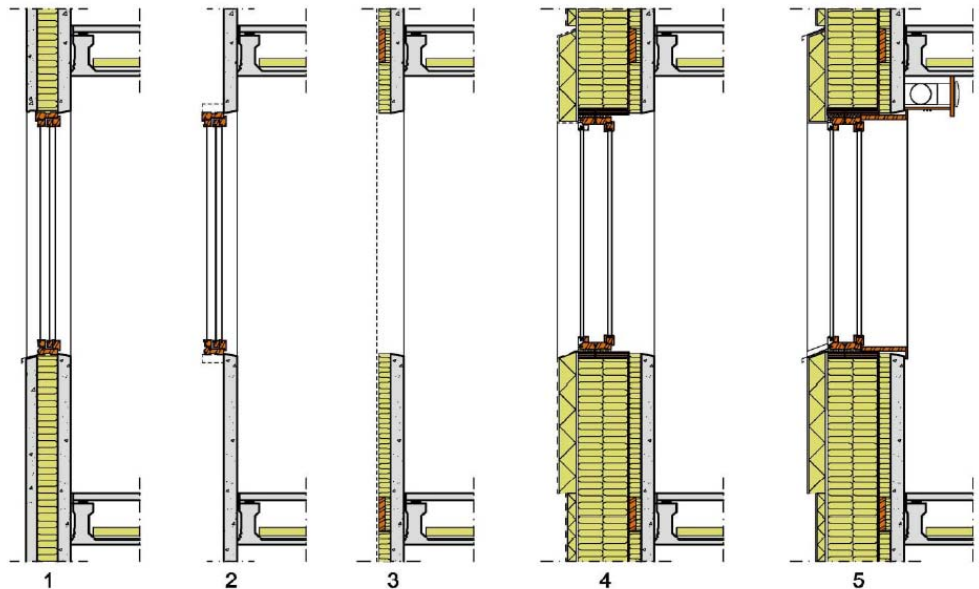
The refurbishment in five steps: from the existing concrete sandwich façade at step 1 to the final assembled and rendered TES element in step 5 [Lylykangas Architects].
